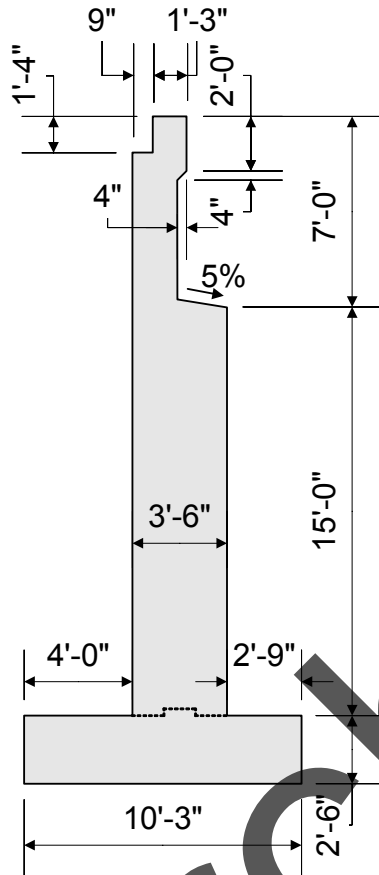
Full-Depth Reinforced Concrete Cantilever Abutment
